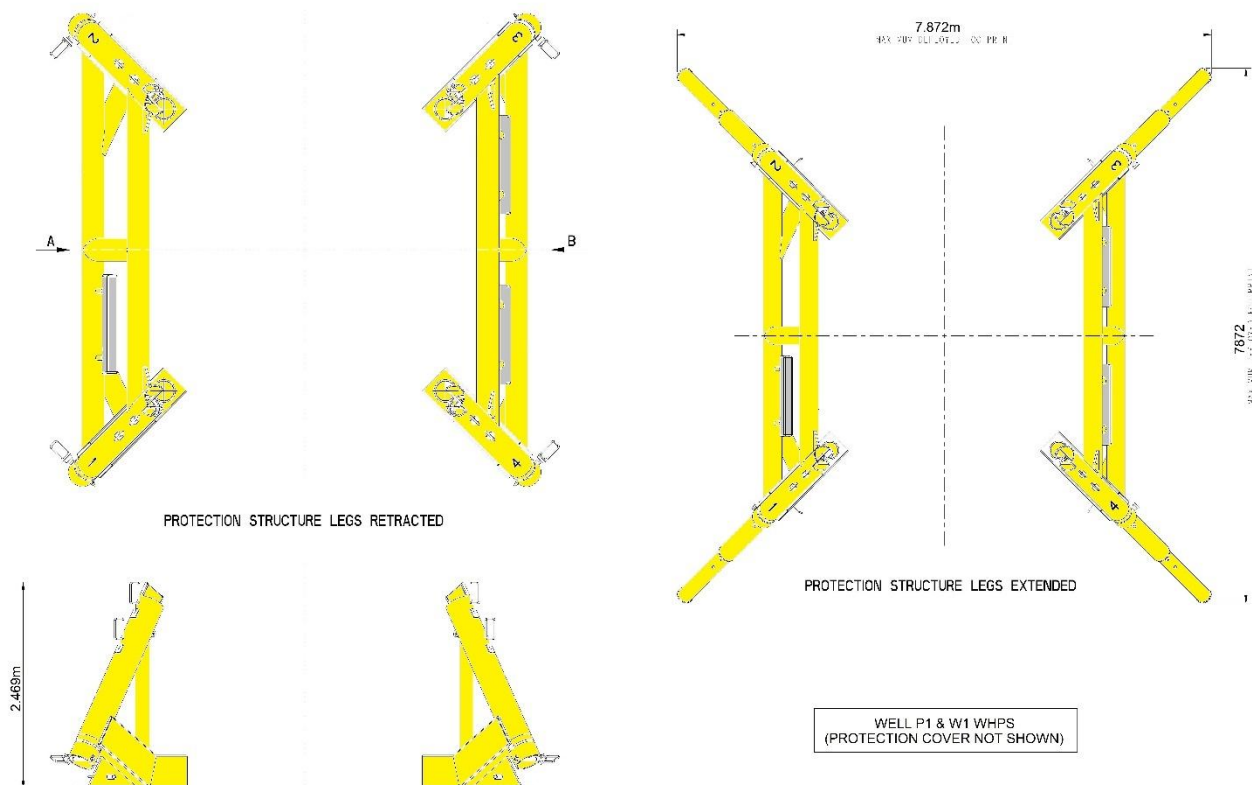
Plan view on WHPS for well P1 & W1 (protection cover not shown)
